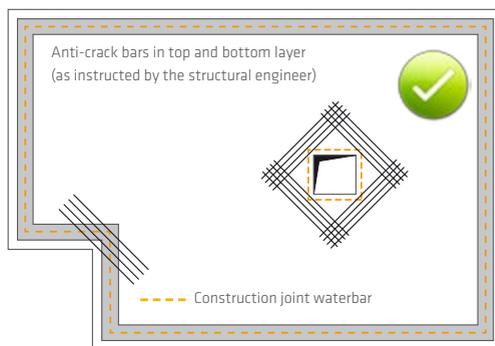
Example of additional anti-crack bars at re-entrant corners, box-outs and other penetrations to prevent diagonal cracking
